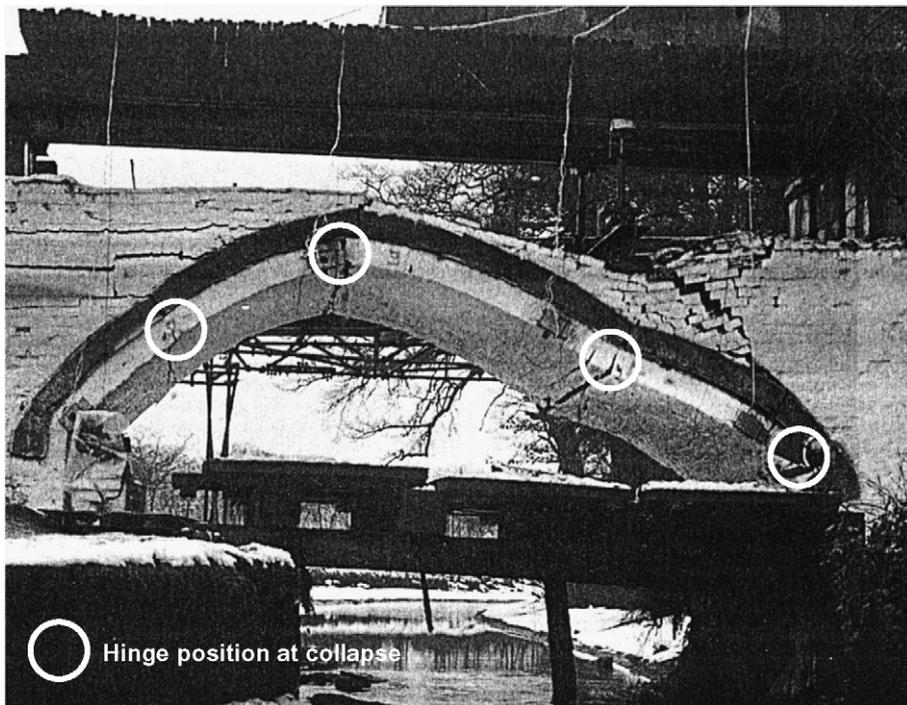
Collapse mechanism of the Prestwood bridge after the destructive test (DT).
